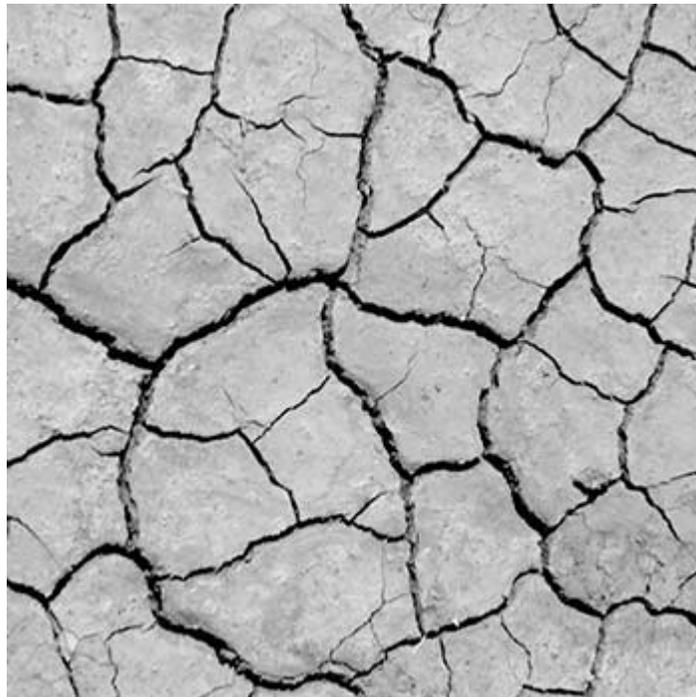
Expansive soil swell/shrinkage strains (Courtesy of [WESI Geotechnica](#)).
